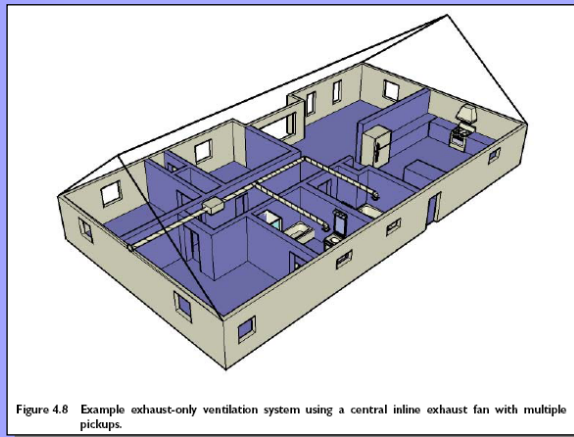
Example exhaust-only ventilation system using a central inline exhaust fan with multiple pickups.
